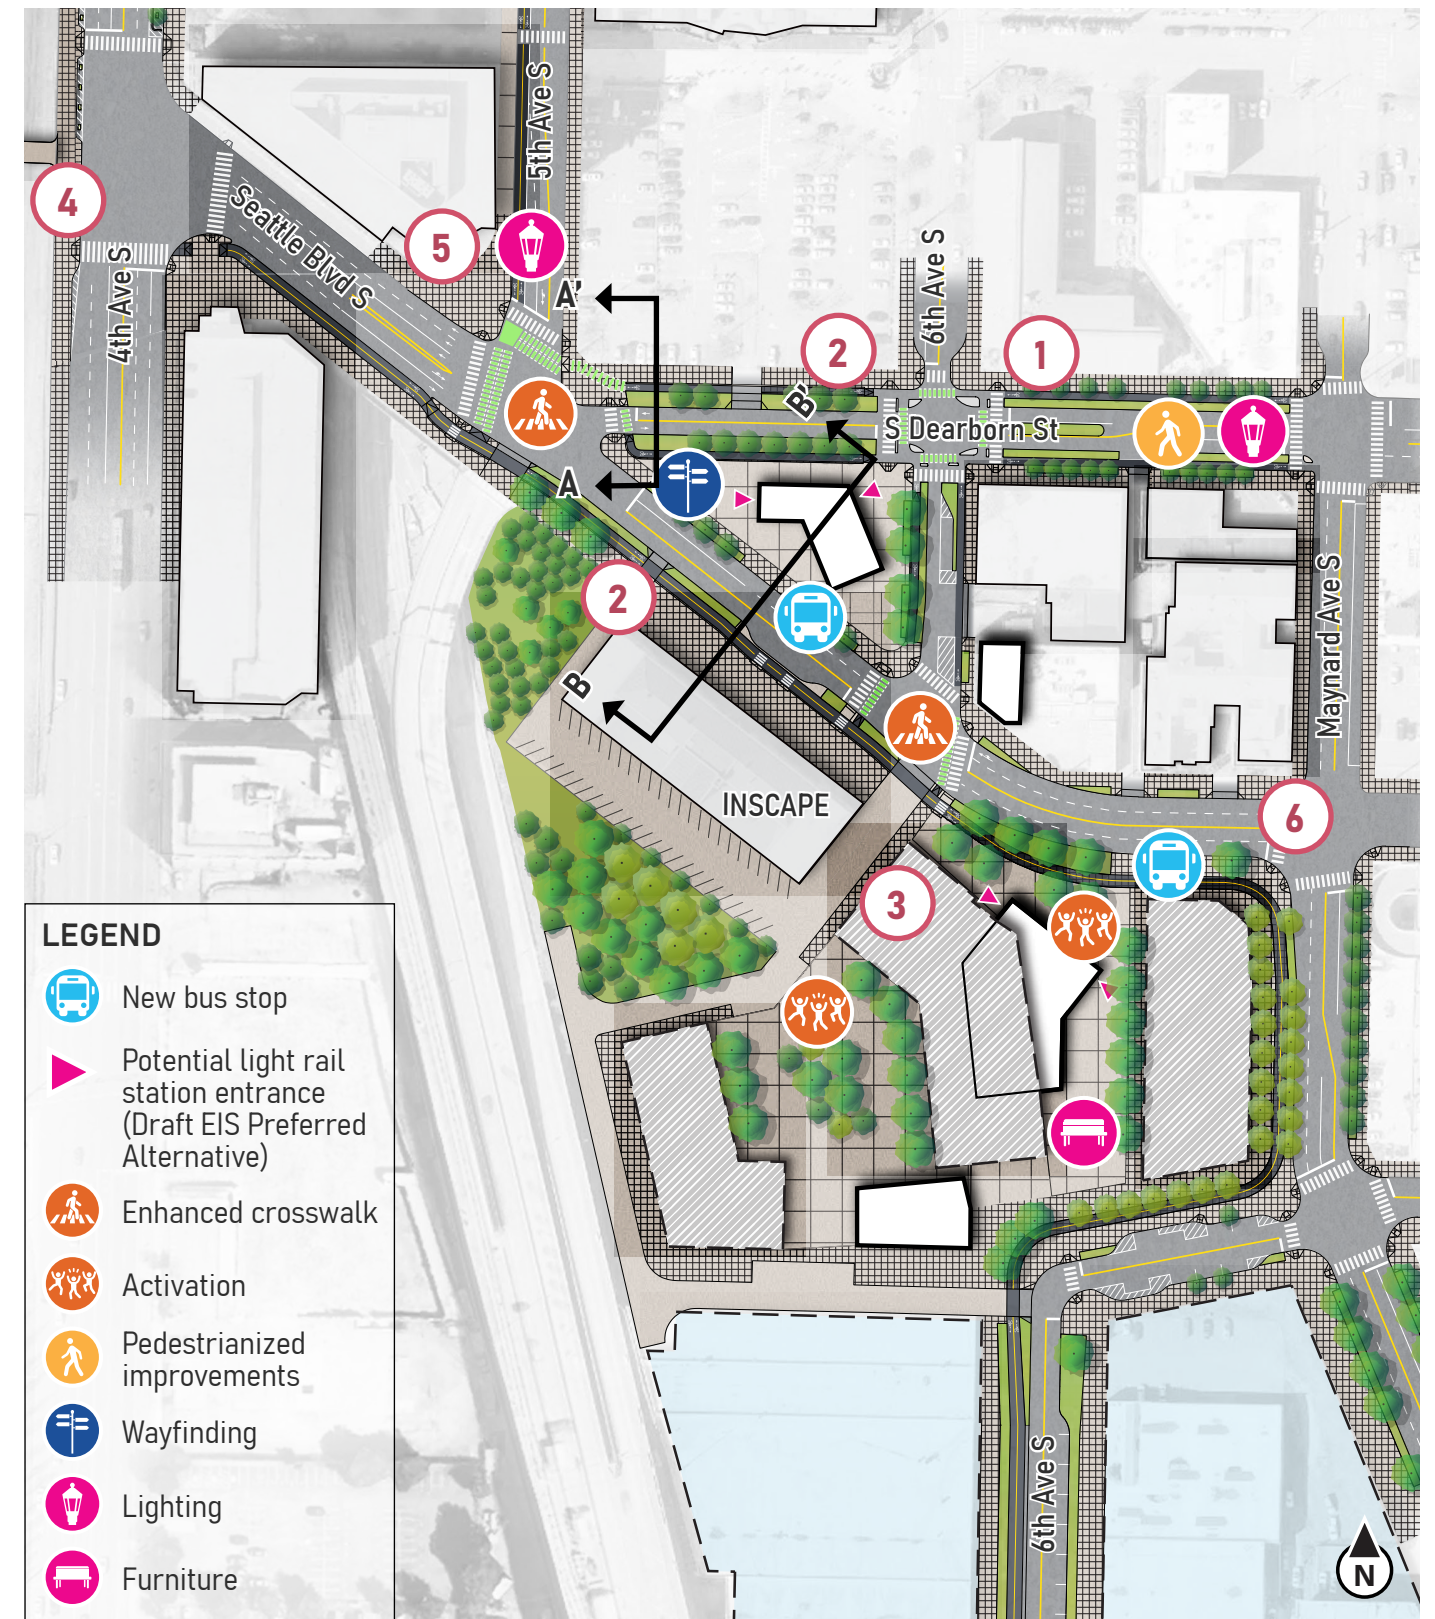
South Focus Area Enlarged Plan. Plan view showing potential improvements. Note: Details of design and implementation subject to ongoing coordination with Stadium District, Ballard Link Extension, and local land use/zoning efforts.
